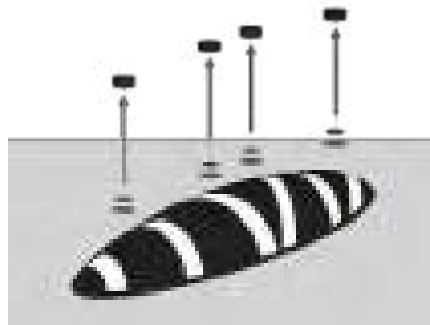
Install the anchors. To ensure that the threaded rod is correctly anchored, it should be rotated while being inserted into the hole (full of resin) so that is covered completely with resin. Once the resin is dry, tighten the nuts with the socket wrench.
